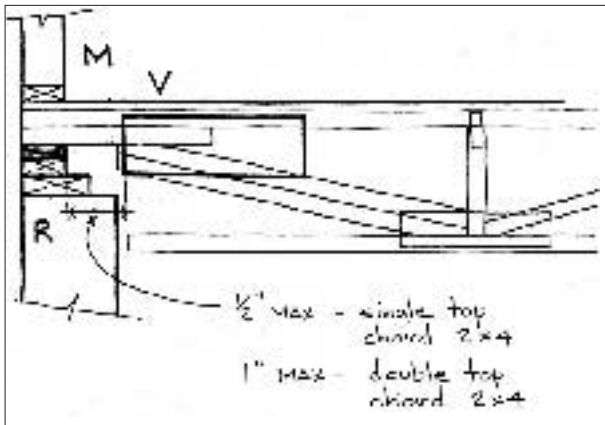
The arrows point to the edge of the truss plate and the inner edge of the mud sill. For single top-chord trusses, this distance can be no more than  $\frac{1}{2}$  inch. For double-top-chord trusses, the distance can be no more than 1 inch.
